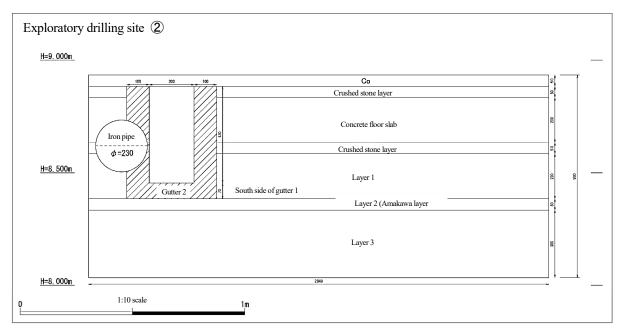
Exploratory Drilling Site ②, plan view
